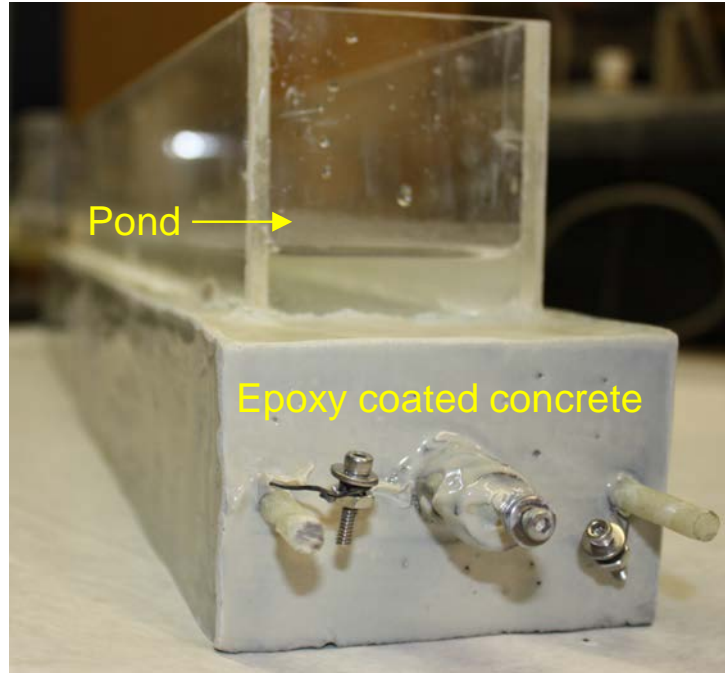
Specimen after applying a layer of epoxy and placing the pond
